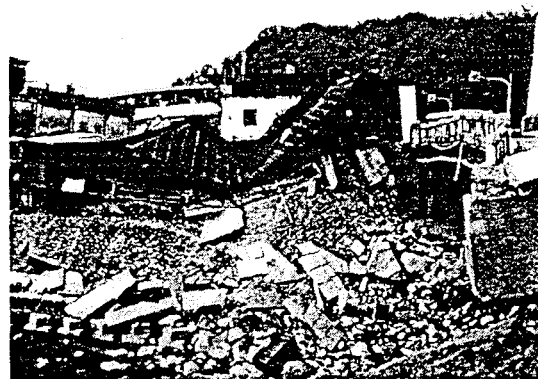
Building collapsed just above fault (Fengyuan City, Taichung County)
